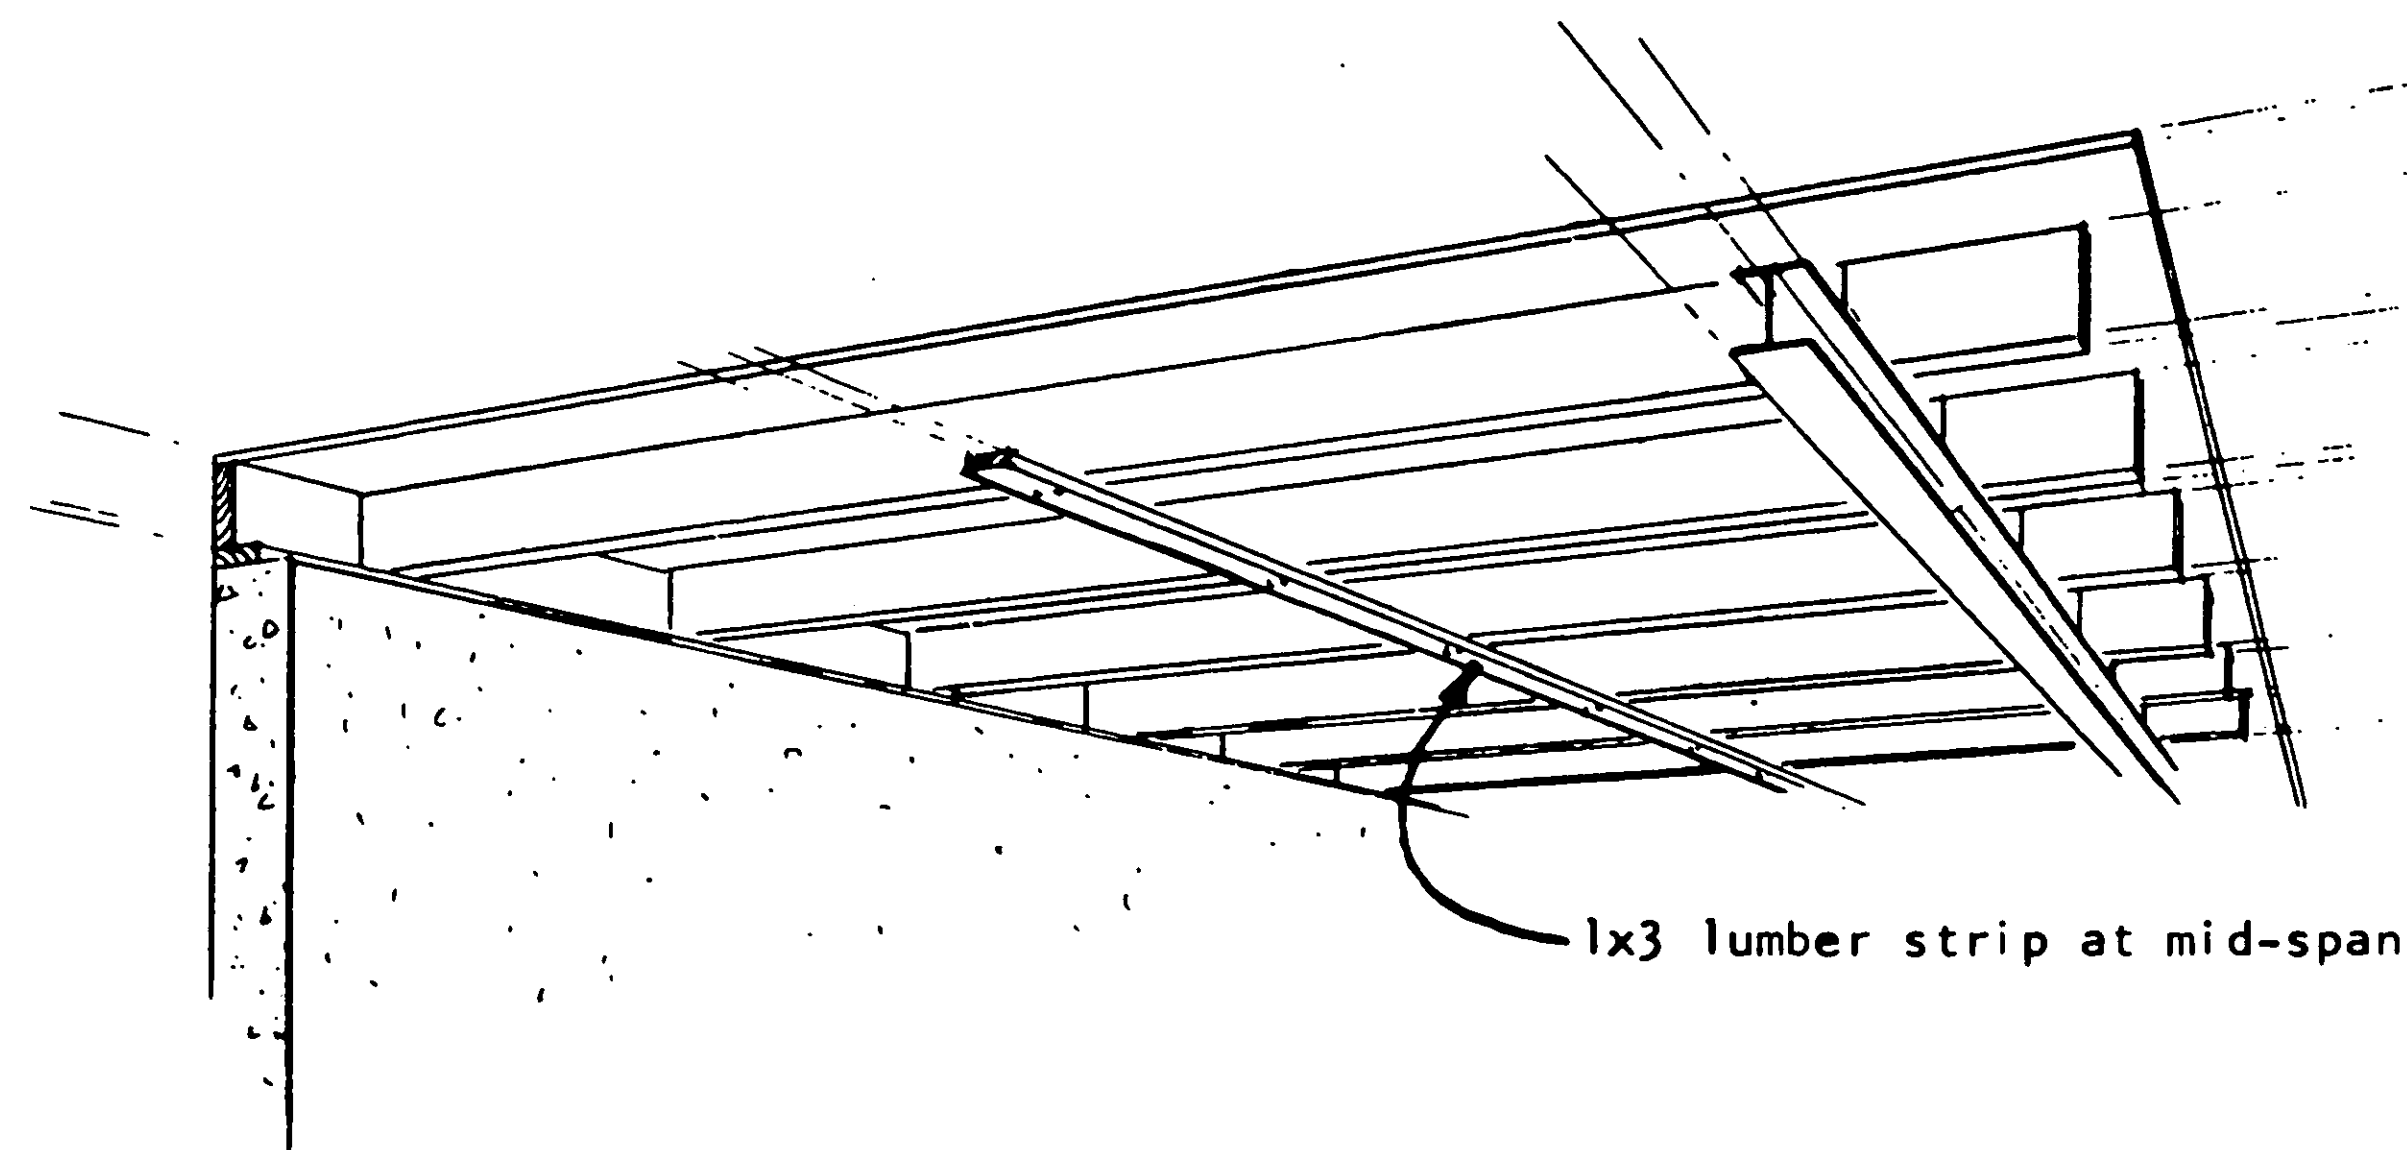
G. Floor bridging is not normally required, however, where green joists have a known tendency to warp, a 1x3 strip of wood will provide restraint where the ceiling is otherwise unfinished.
